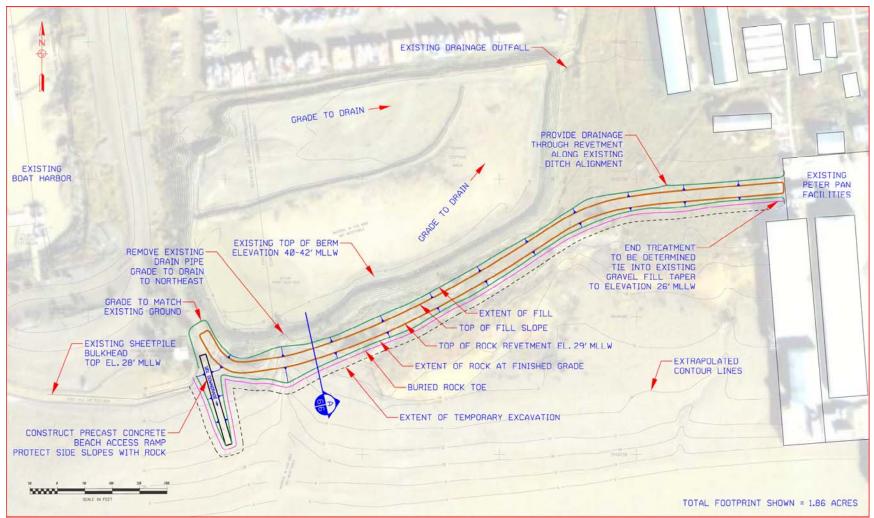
, Alternative C3 – Revetment: Project Plan/Site Map
